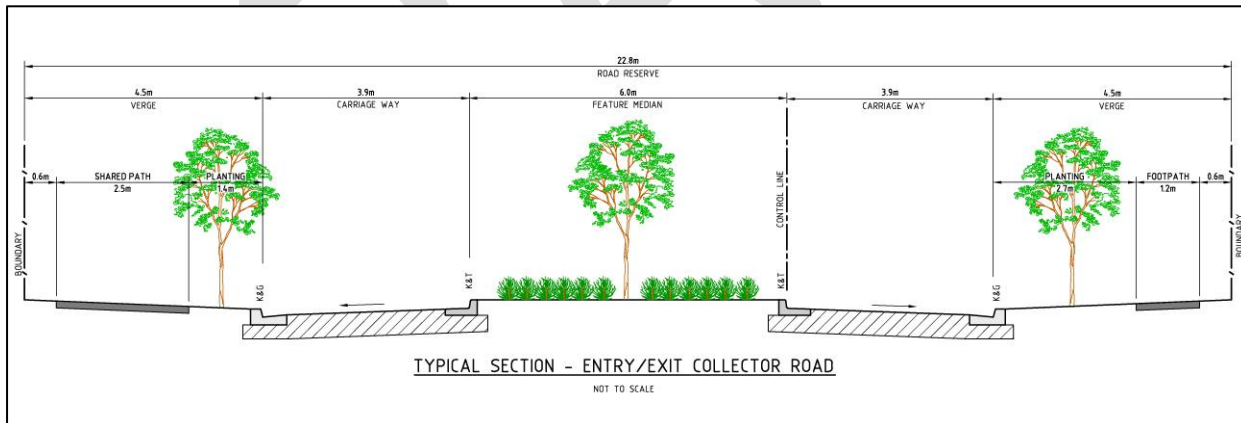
Emerald Hills Typical Entry / Exit Collector Road
